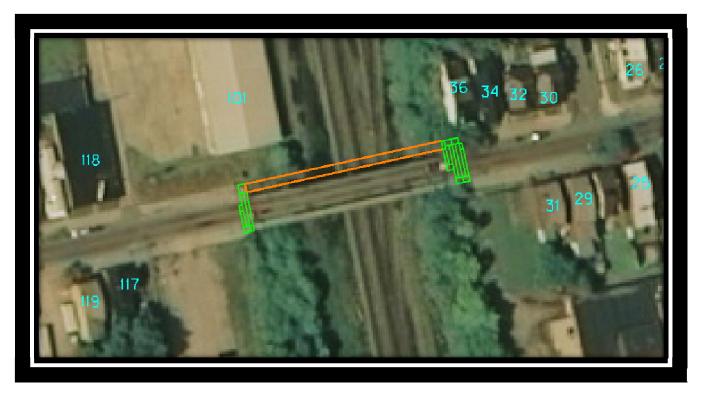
Preliminary plan view of Alternate X. The orange line represents the proposed pedestrian bridge, and the green line represents pedestrian ramps to the bridge.
